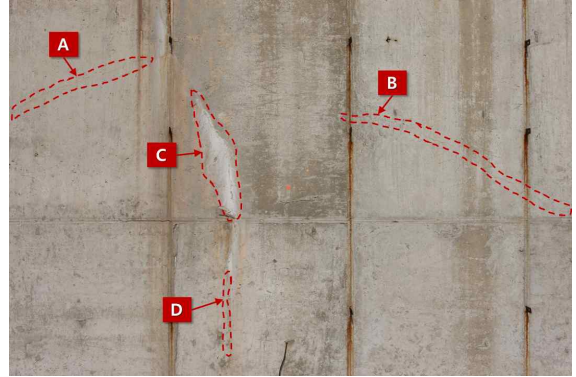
Damage points of visual inspection drawing (section B-E32)
